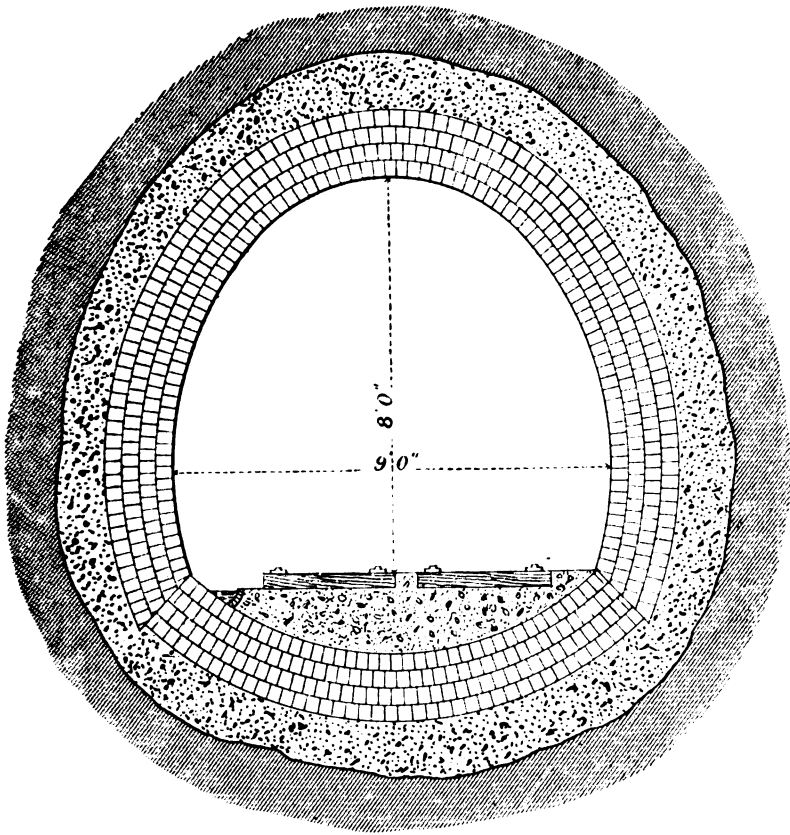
ARCHING FOR UNDERGROUND ROADWAY WHERE THE SIDES AND ROOF FORM PART OF AN ELLIPSE, AND THE FLOOR AN "INVERT" OR FLAT SEGMENT ARCH.
